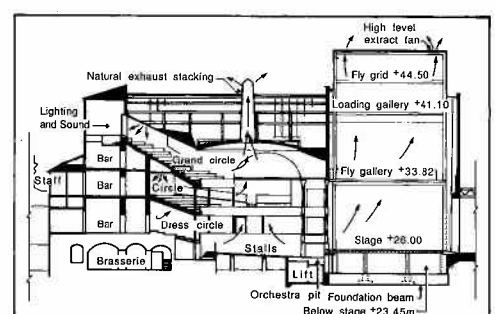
Section through Theatre Royal showing air distribution pattern
